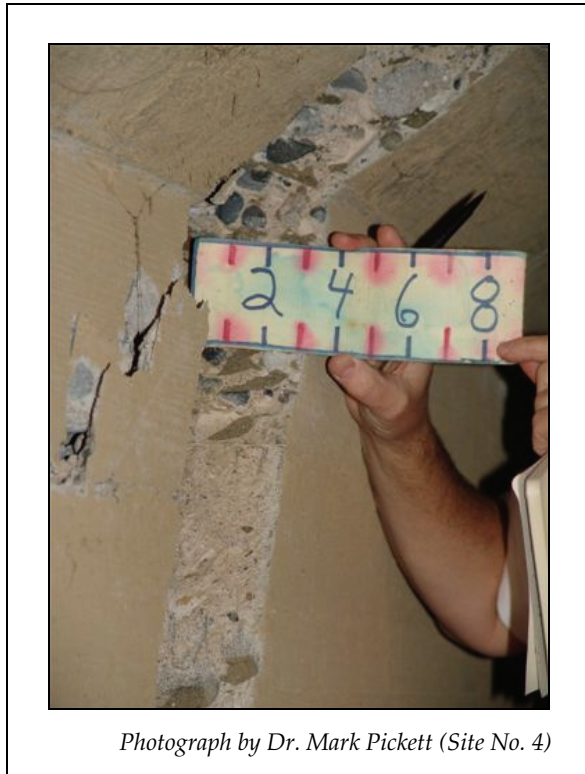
Shear failure resulted in a 3-inch wide crack in the three-celled concrete box culvert at km 190
